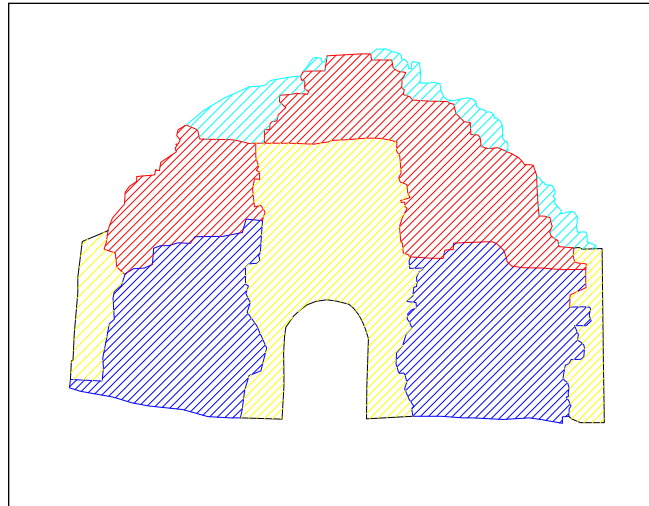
Suggested construction sequence visible on the west-facing elevation of the west wall of the church (north to the left of the section)
